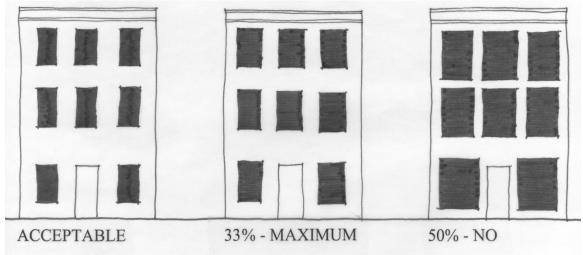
The amount of window area in a traditional masonry wall is less than one-third of the total facade area. When this ratio of window area is increased beyond one-third by a proposed building, the proposed wall loses its compatibility with its historic neighbors.
